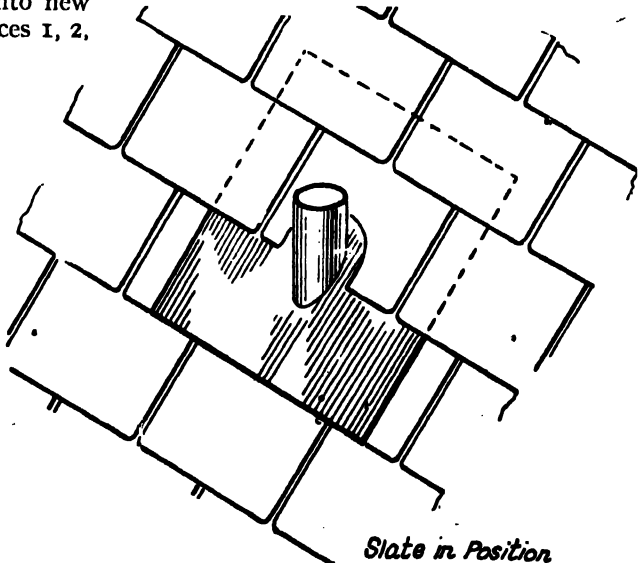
Lead slate in the form of sheet lead shaped to provide weather-proof joint where pipe passes through sloping roof. See also Plate facing page 657 (Lead-burning).
